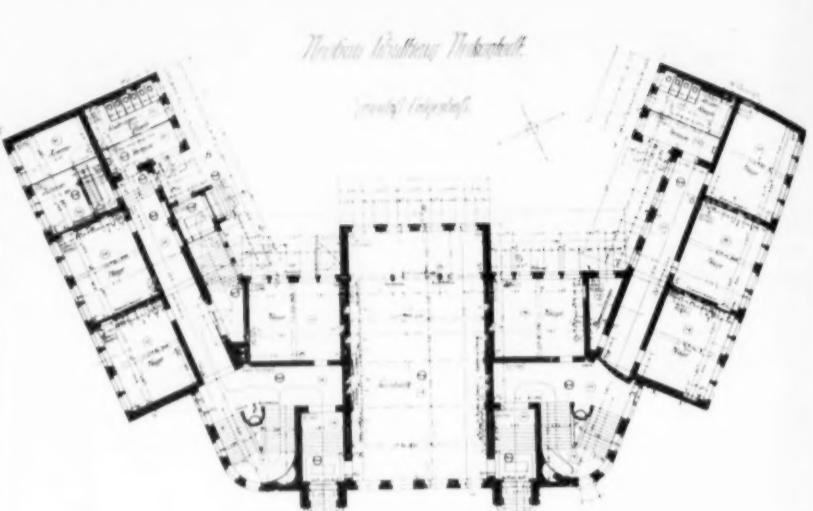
FIRST FLOOR PLAN OF NEW SCHOOLHOUSE IN MANNHEIM, GERMANY, SHOWING THE PLACING OF VERTICAL AIR DUCTS IN THE PARTITION WALLS BETWEEN THE CLASSROOMS.
